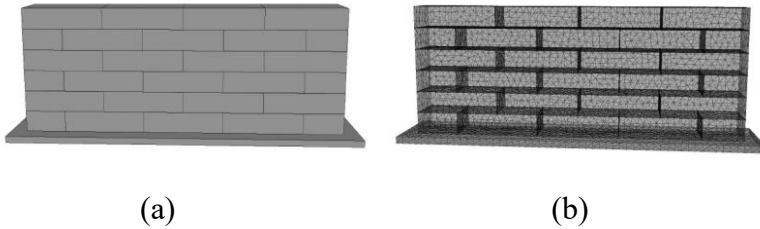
Subdivision of a planar wall: (a) a masonry planar wall and (b) block subdivision into tetrahedral finite elements.
